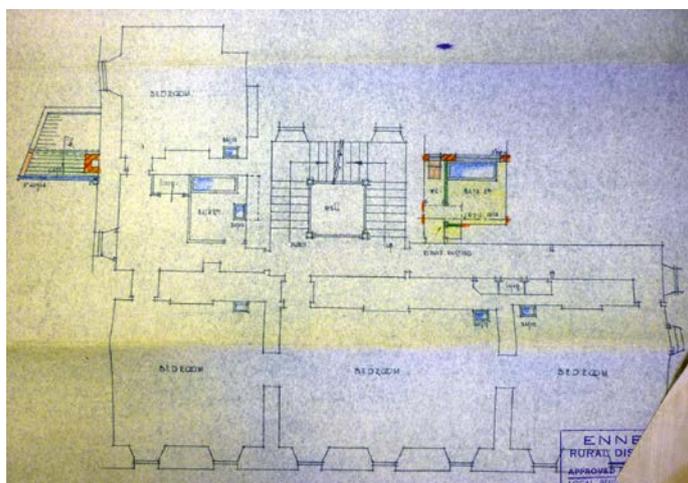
Proposed alterations and additions to the first floor, 1940 (CAC(W) SRDE/3/PLANS1/497 1940)
